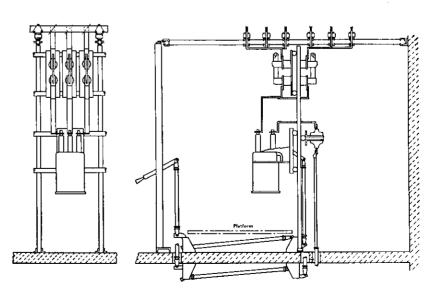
Double Bus System with Disconnecting Switches Between Buses and Breaker Platform Recommended When Bell Cranks are Mounted Above Floor.
